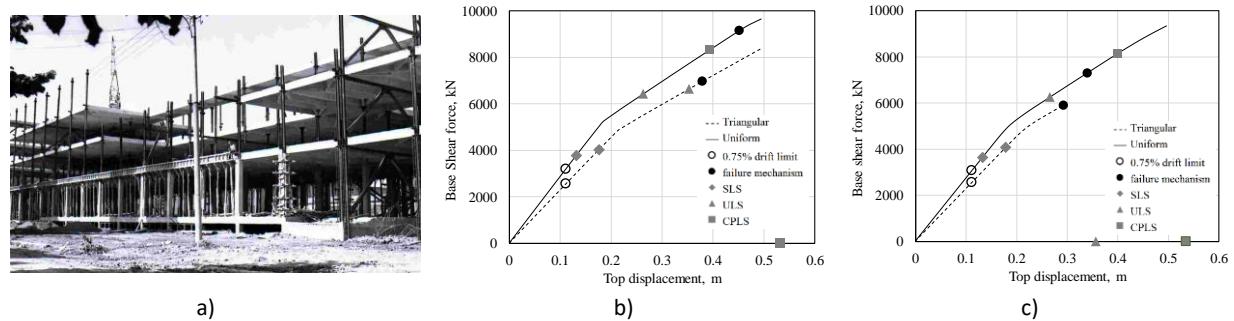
Case study building: a) building during construction; b) force-displacement curves for existing structure, longitudinal direction; c) force-displacement curves for existing structure, transversal direction.
